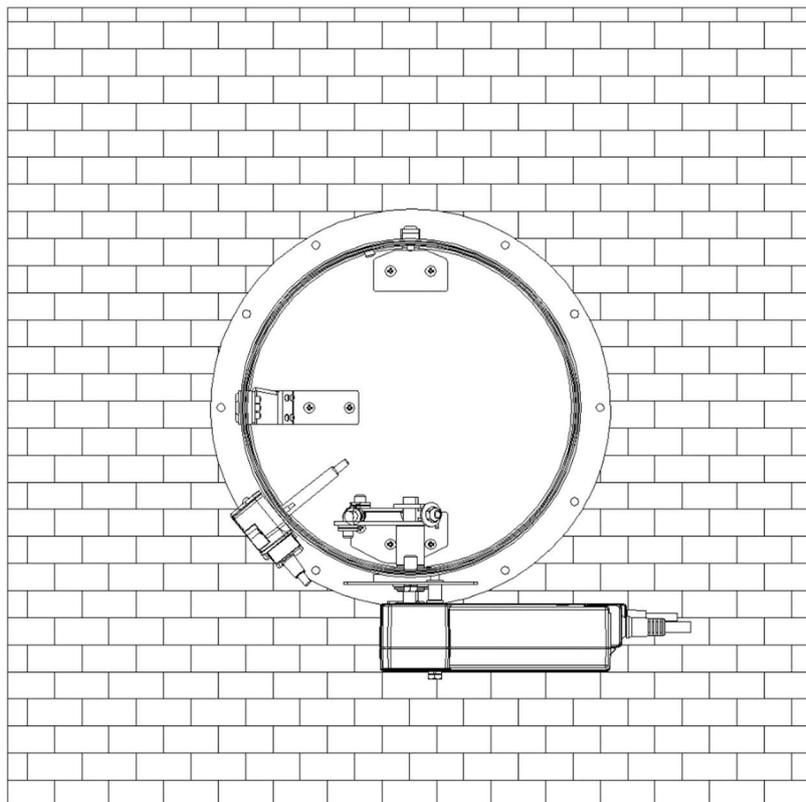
Installation of KTS-O in rigid wall construction with vertical axis of rotation of the damper.
